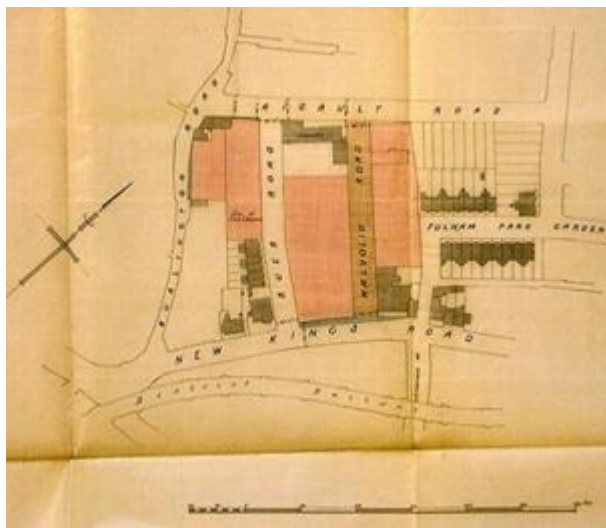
Original plan for site in 1897 (LMA ref: GLC/AR/BR/22/012187)
